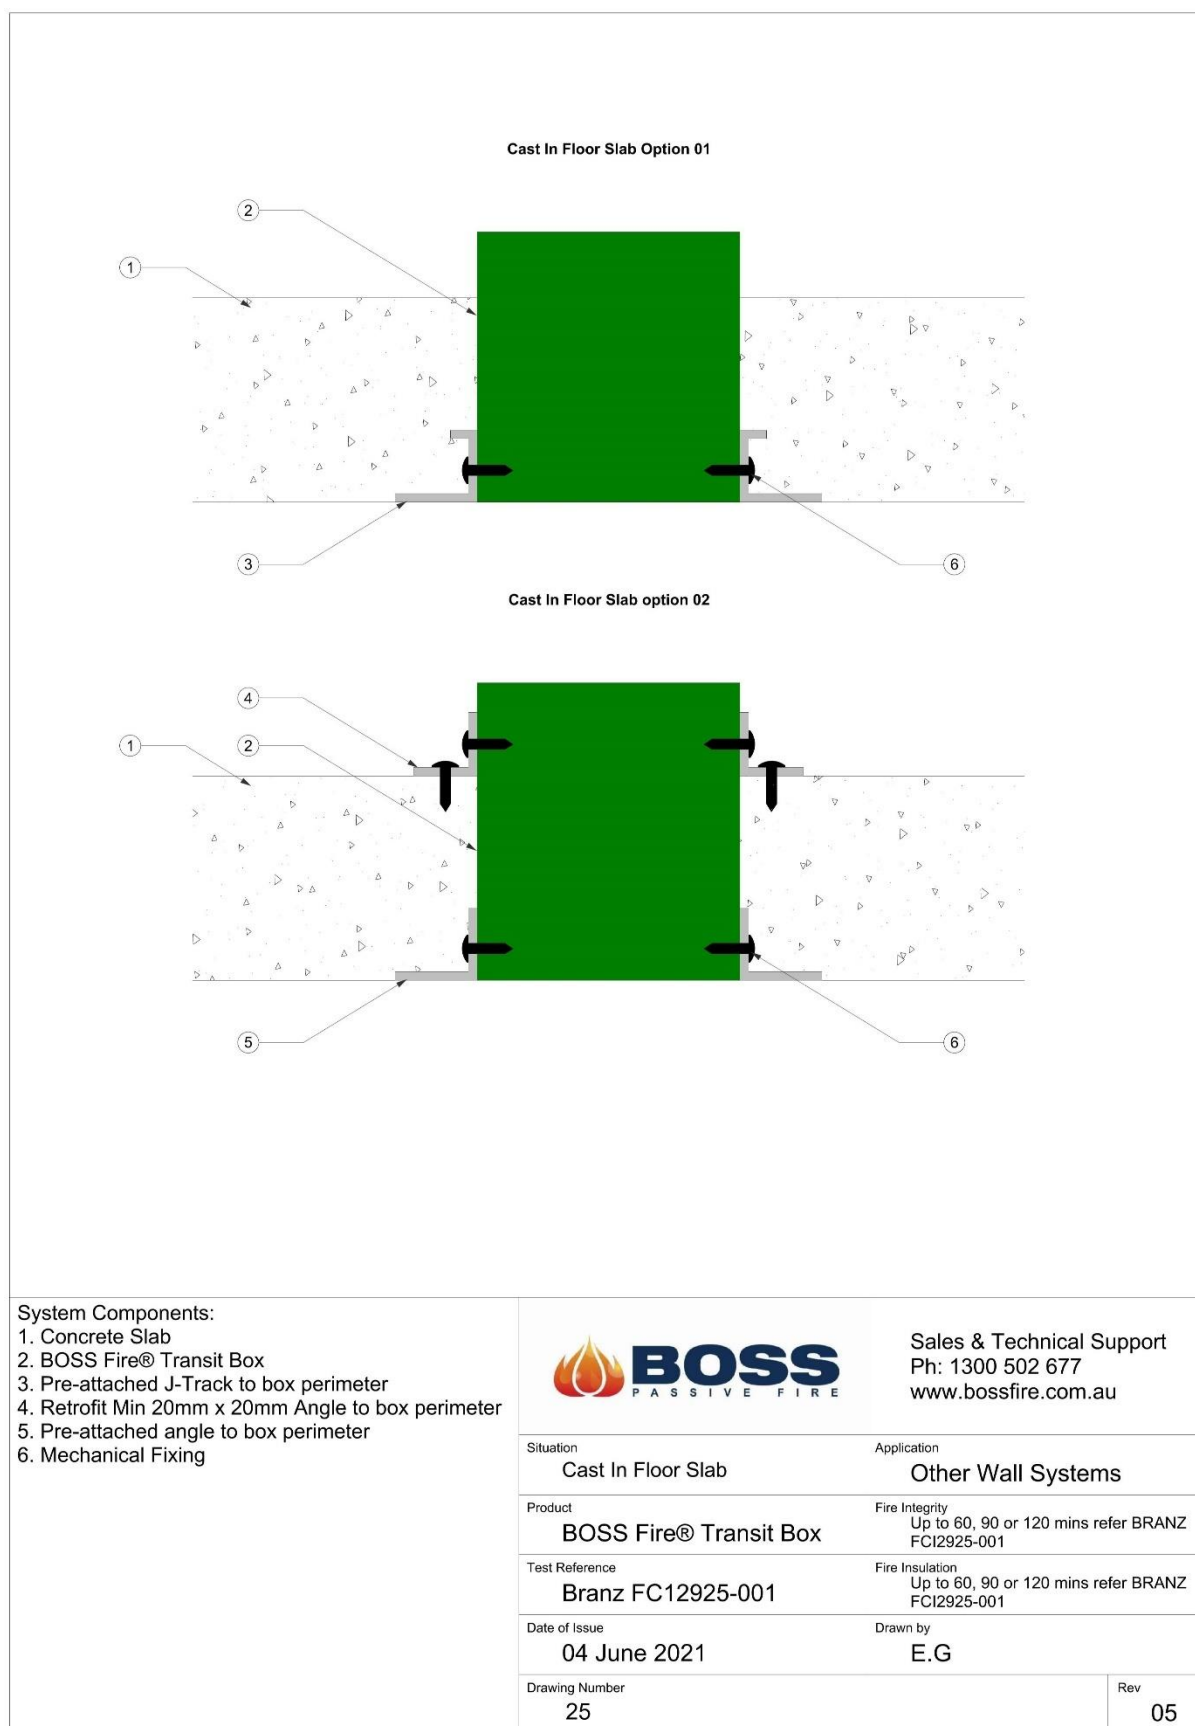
BOSS Fire® Transit Box – Floor/Ceiling Systems
